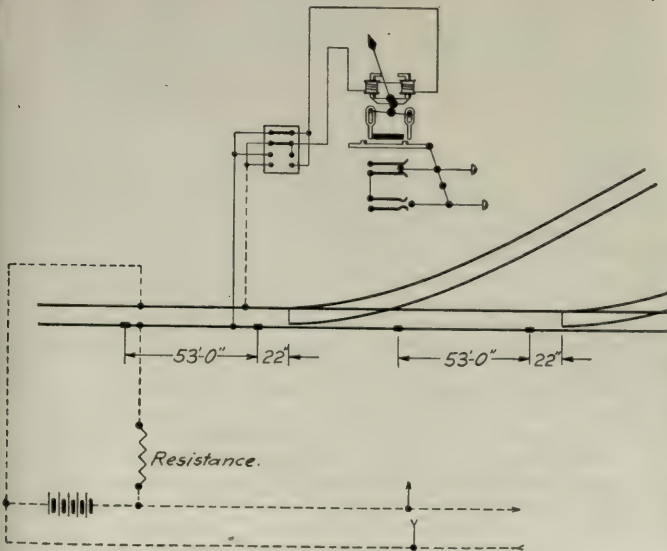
Arrangement of Insulated Joints at Switches Controlled by Push-Button Machine.
